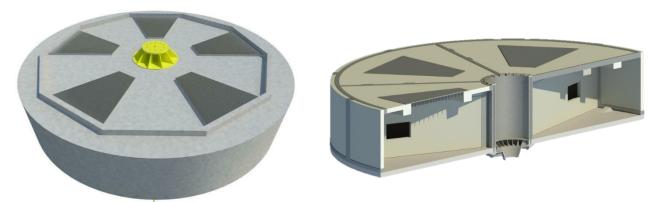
Stage 1 'in-situ' BA Design (left image) and Stage 2 Precast BA Design (right image).
